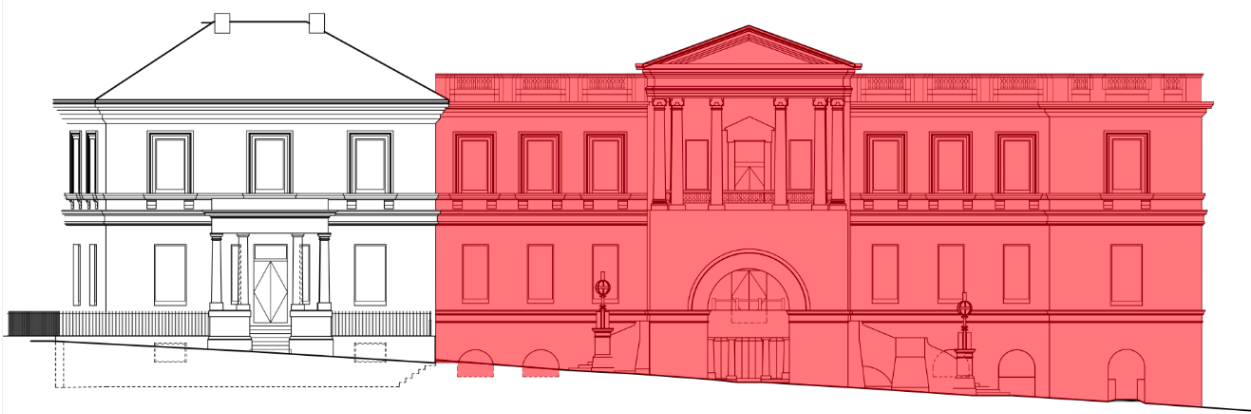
Diagram indicating building stage relevant to this section of the Historical Overview shaded red
